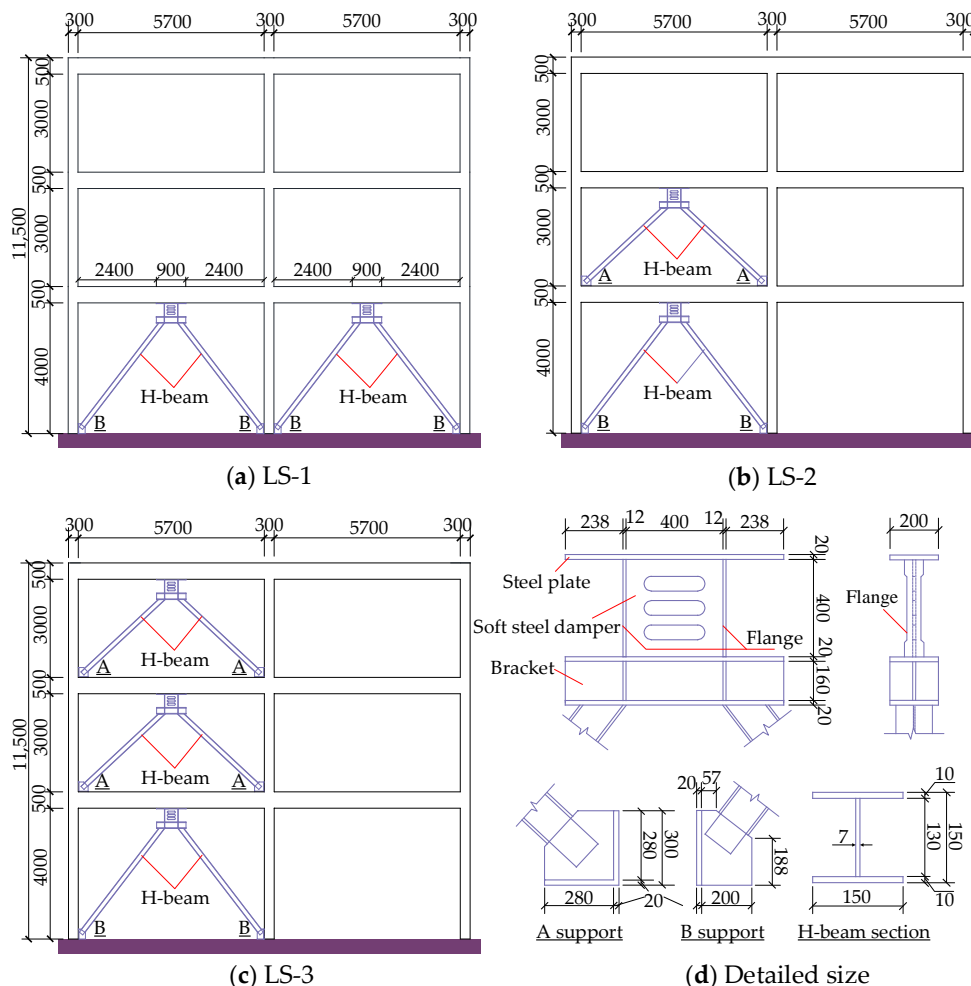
Layout schemes (a–c) and detailed size (d) of CSSDB systems for MD-RC frame (all dimensions in mm).
